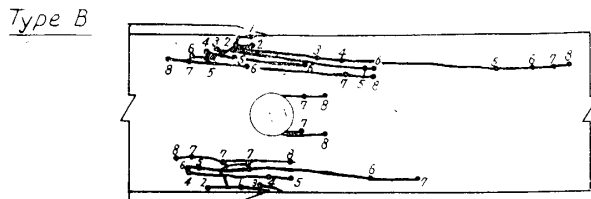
Development of failures of a holed specimen (type B) by repeating load.
